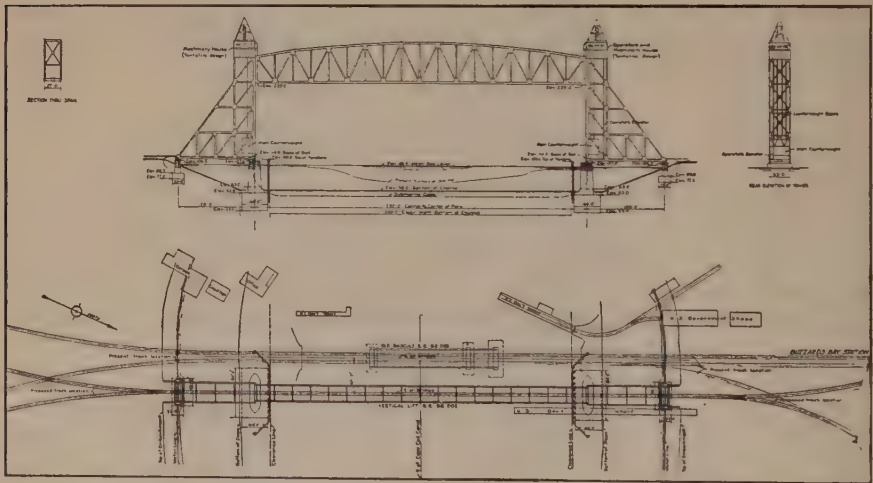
RAILWAY BRIDGE OVER CAPE COD CANAL
